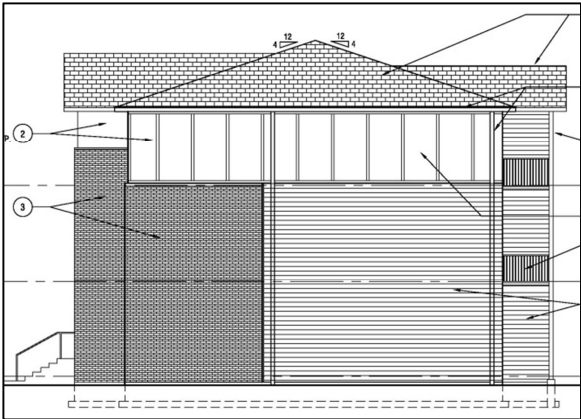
DETAIL OF APARTMENT BUILDING SHOWING EXTERIOR DESIGN AND TYPICAL ENTRY
